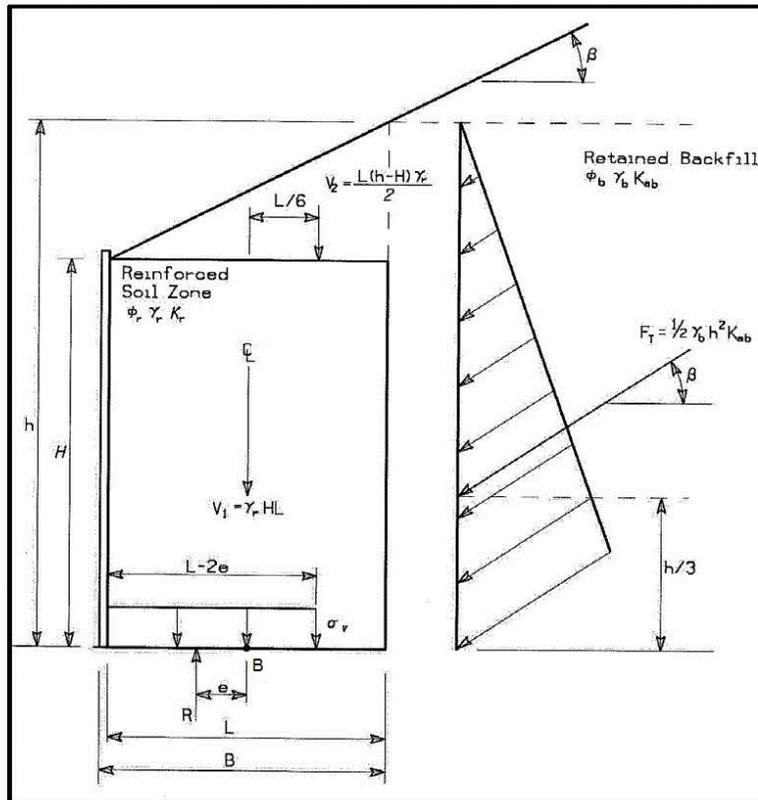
, MSE Wall Eccentricity Check for Sloping Backfill (Berg, et al. – Vol. I (2009))
